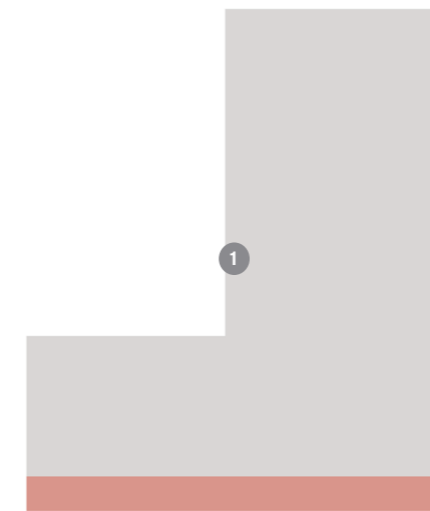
Building B1-2 - façade principles O1 (Illustrative)
